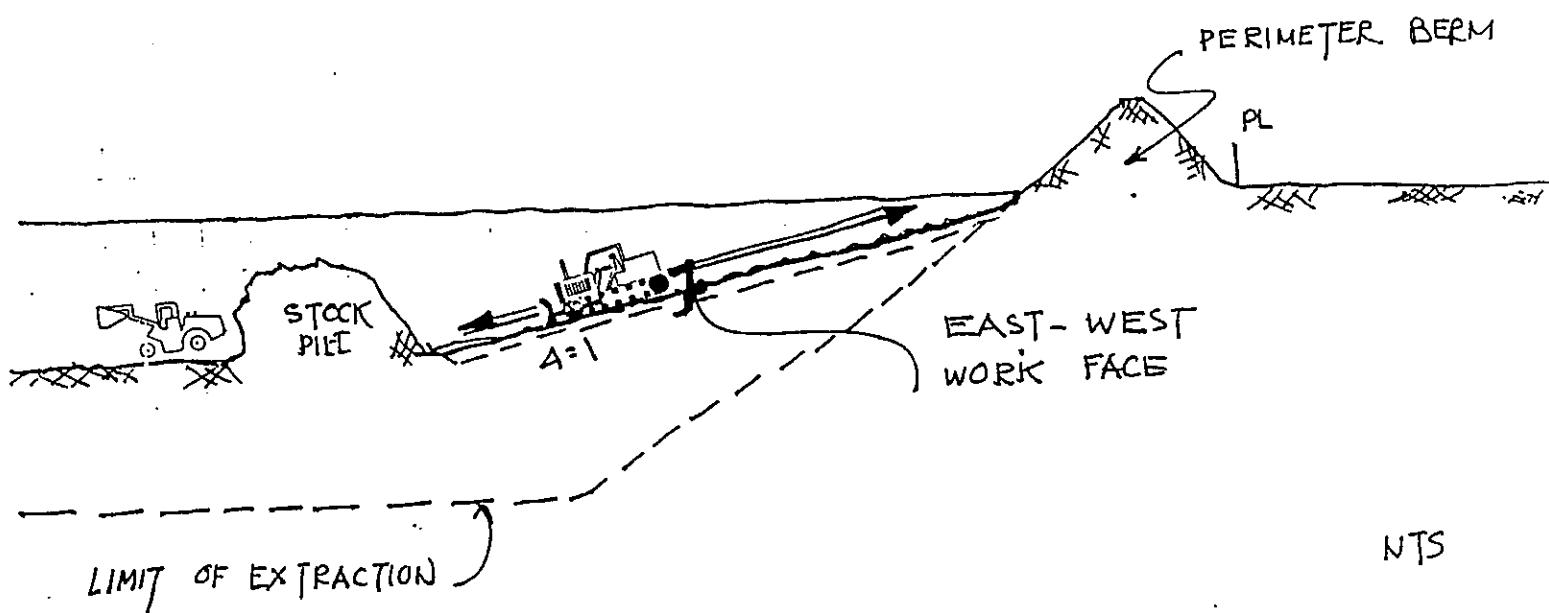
TYPICAL OPERATIONS AND WORK FACE LAYOUT
